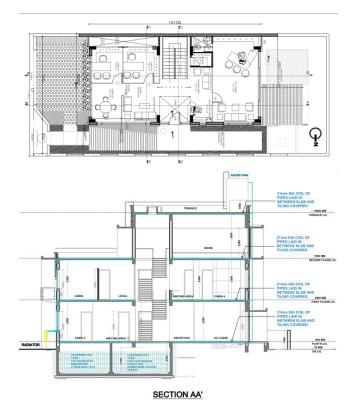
(a) Plan and (b) Section of the office building in Nashik
